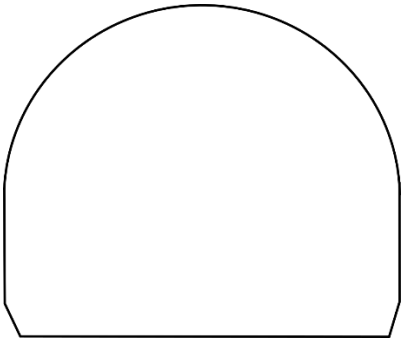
Typical cross sectional shape of a blasted hydropower tunnel [11].
